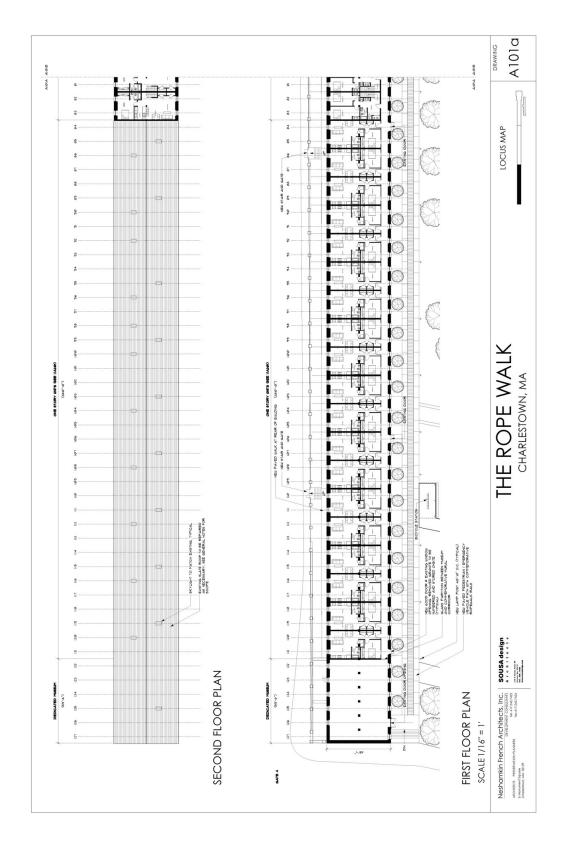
PNF Partial 1st/2nd Floor Plan - Ropewalk
